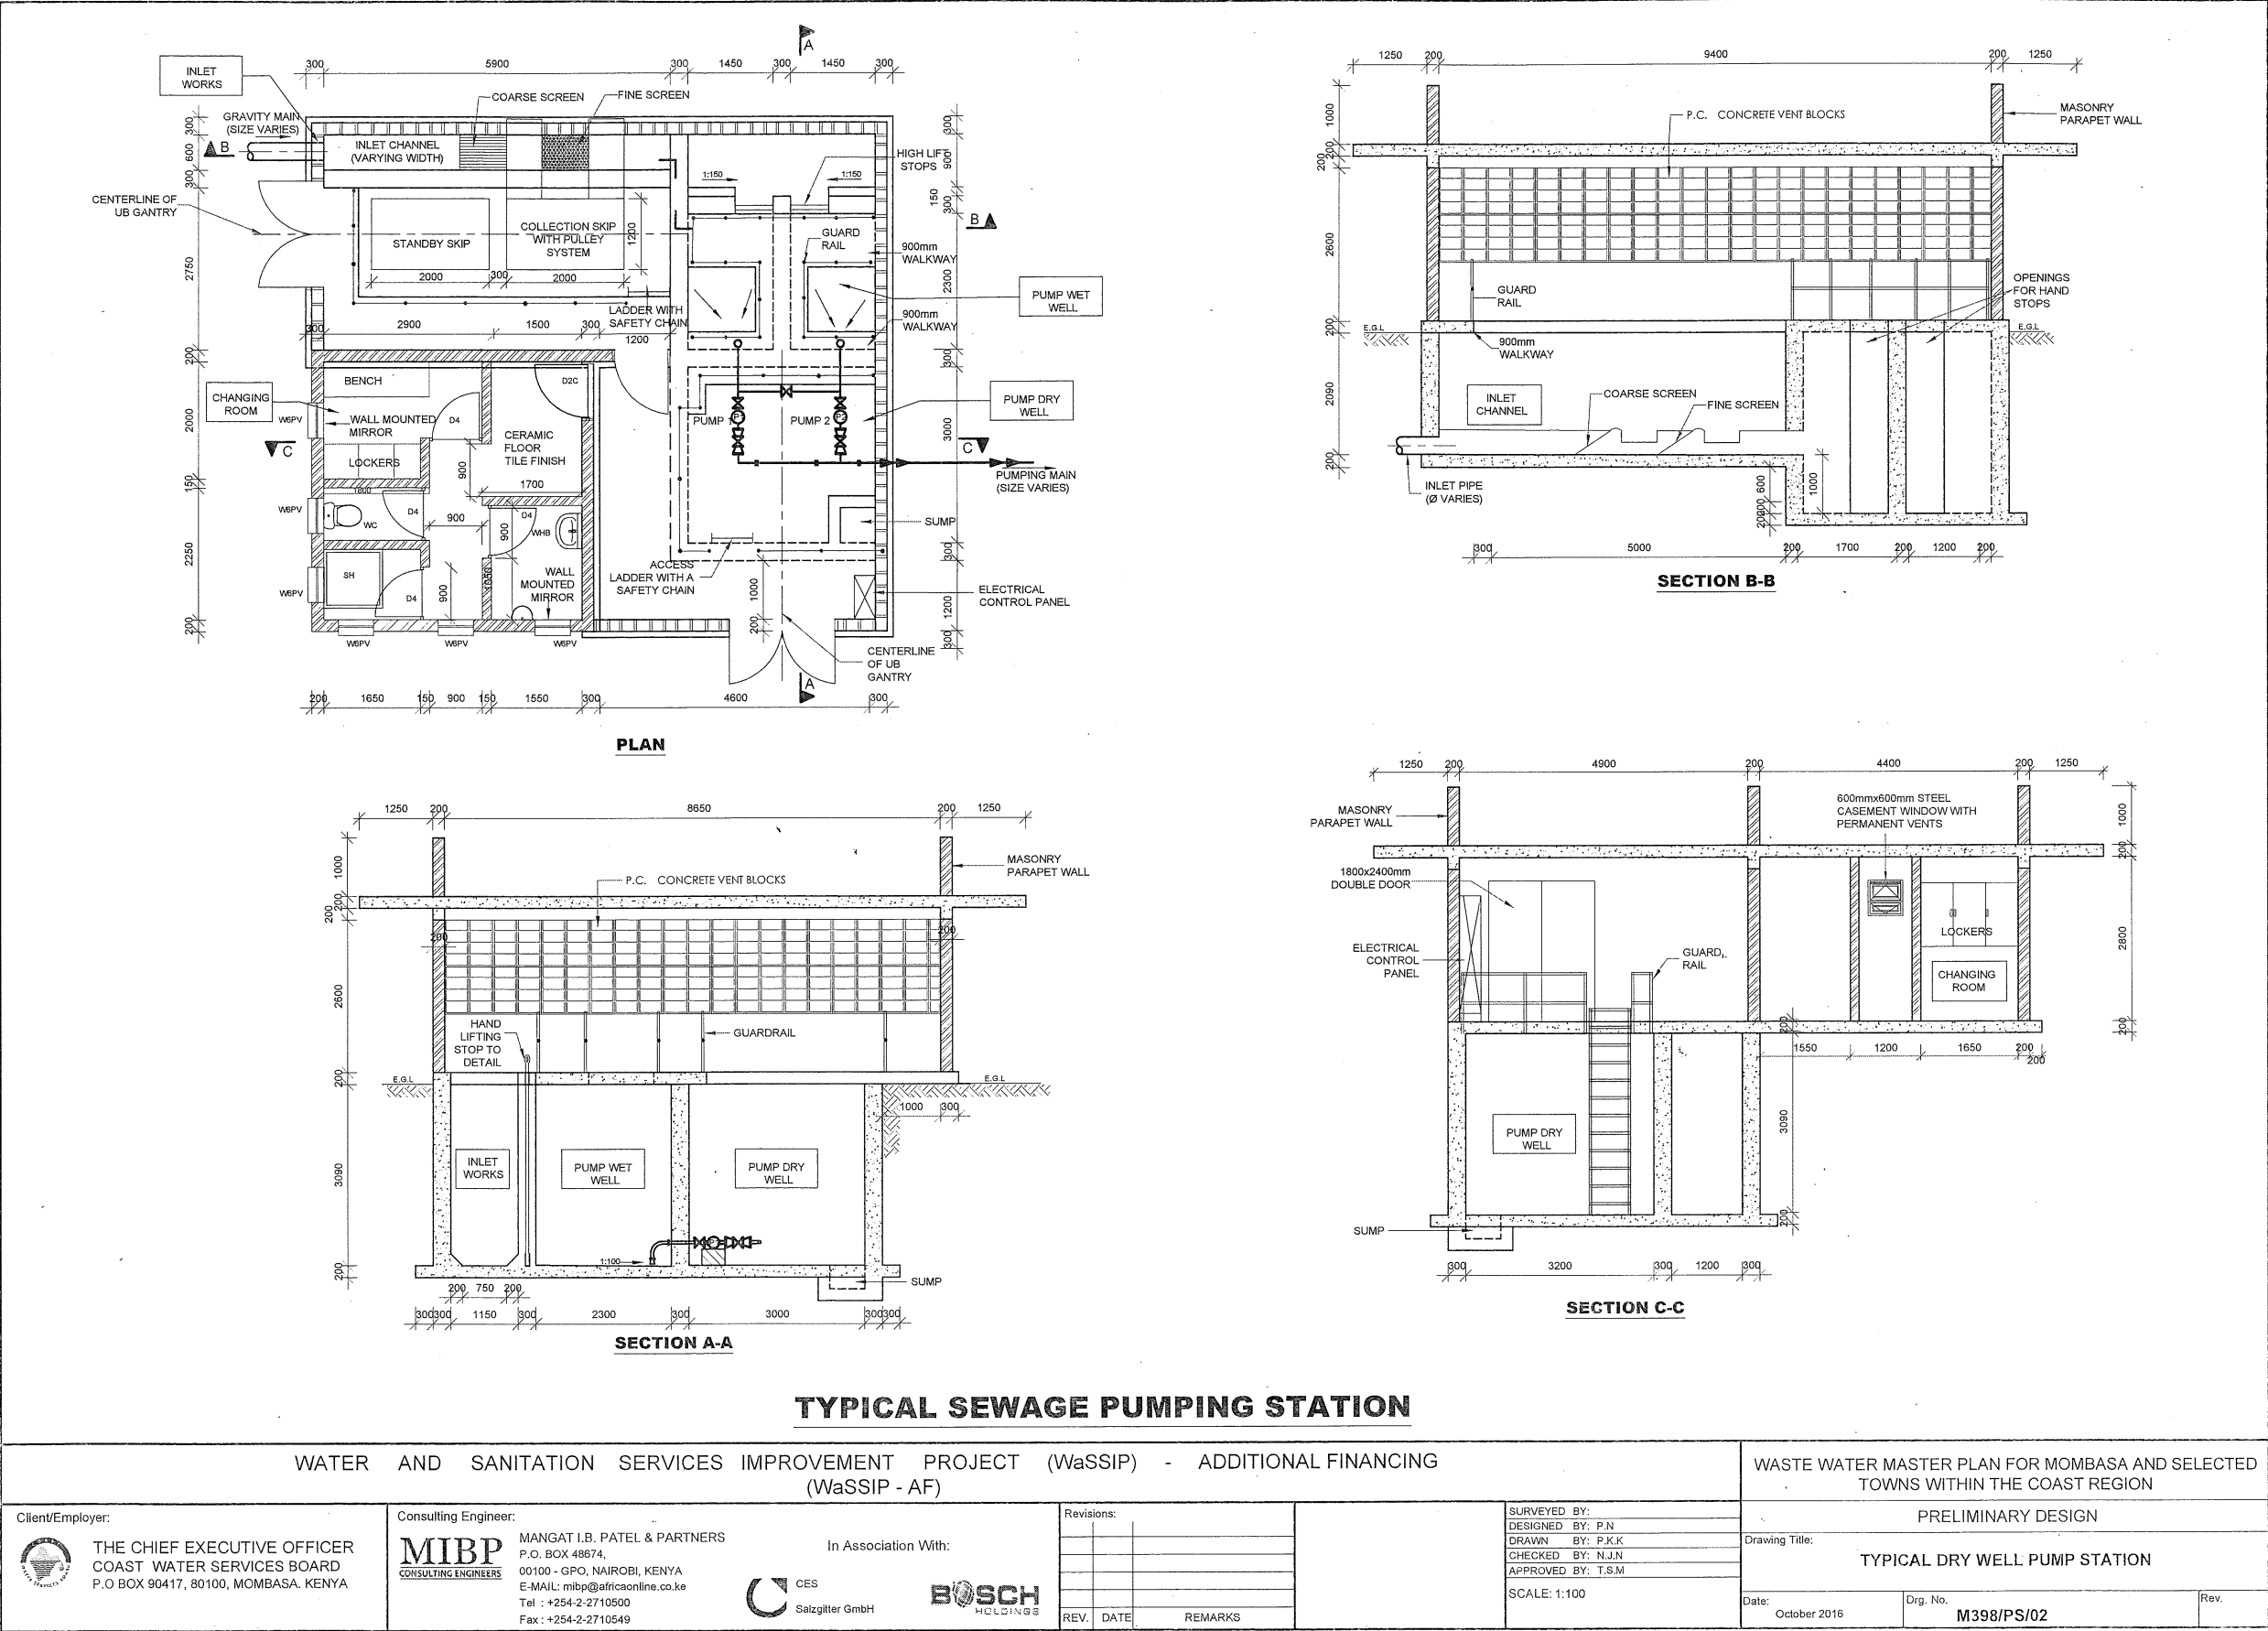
Typical Layout Plan and Sections of a Centrifugal Pumping Station
